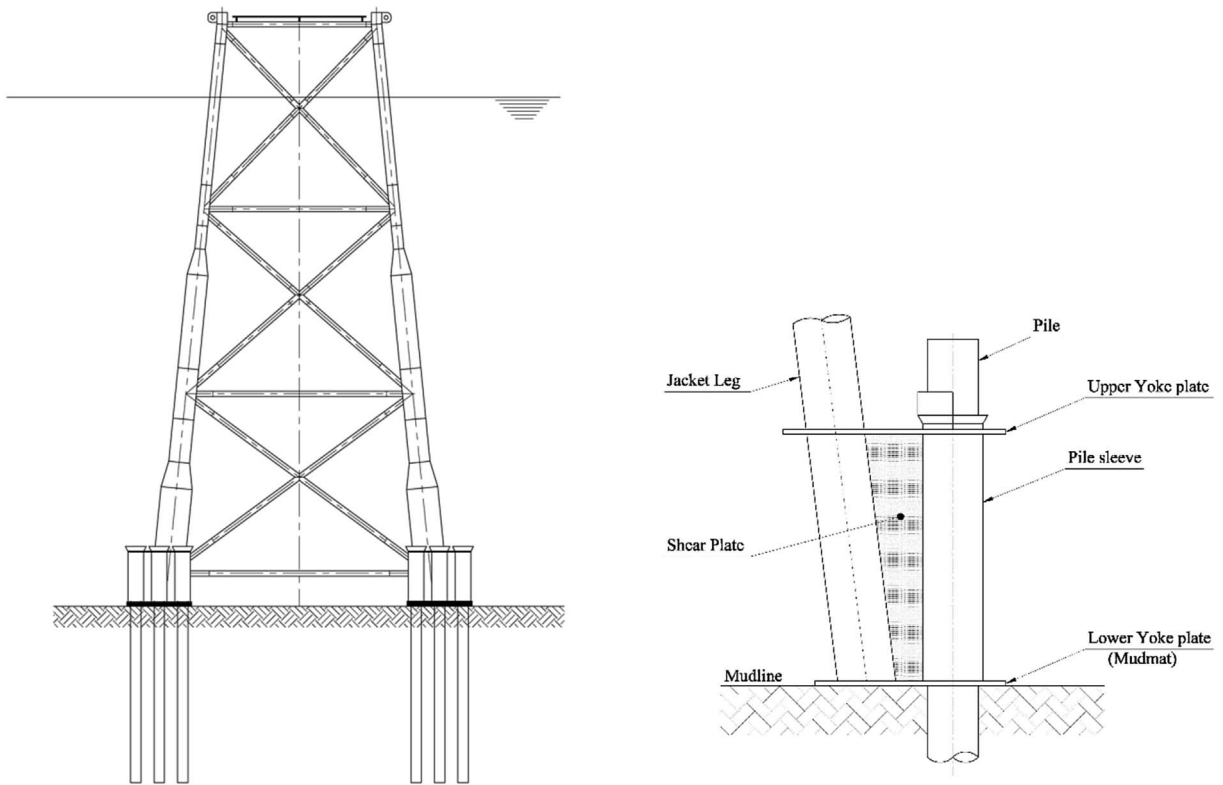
Typical jacket structure with pile sleeve connection detail.
